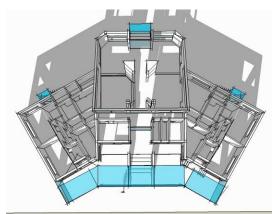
Project's Plan. Notice the added double entrances to the south green house and northwest, north and northeast entrances.
